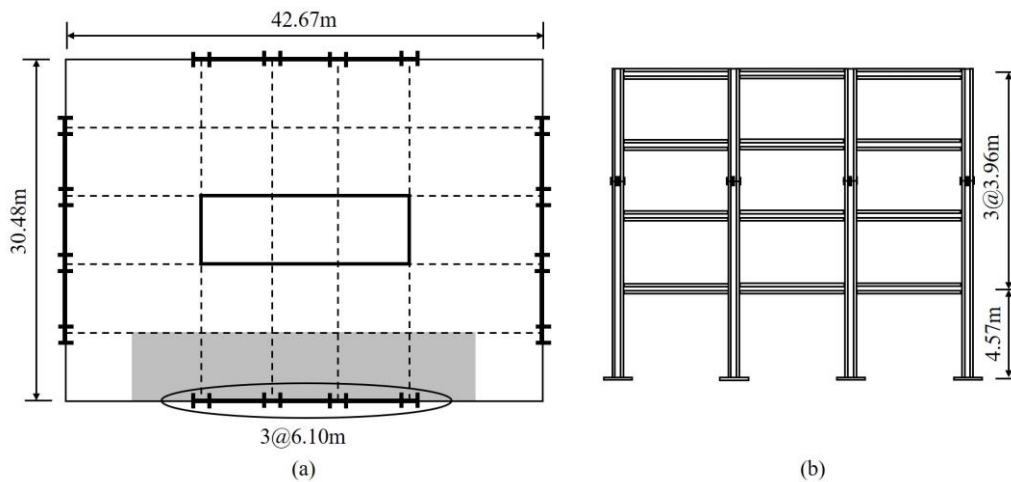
Schematic illustration of 4-story archetype frames: (a) plan view; (b) elevation.
